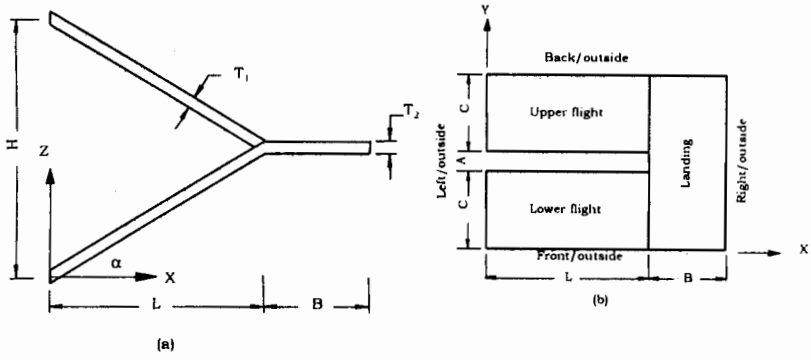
Stair Slab Geometry, (a) Elevation, (b) Plan
